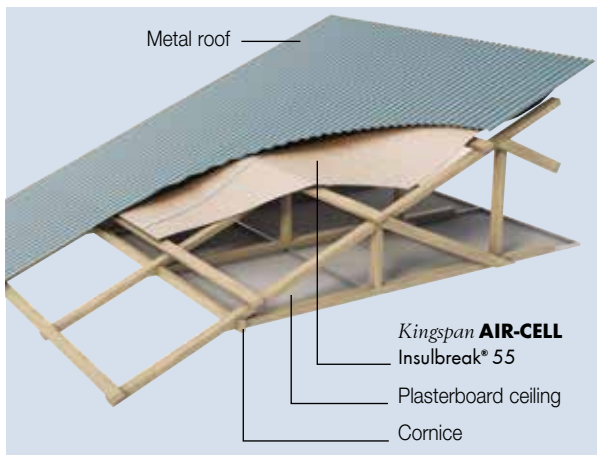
Kingspan AIR-CELL Insulbreak® 55* in a metal roof with an attic space and flat ceiling
